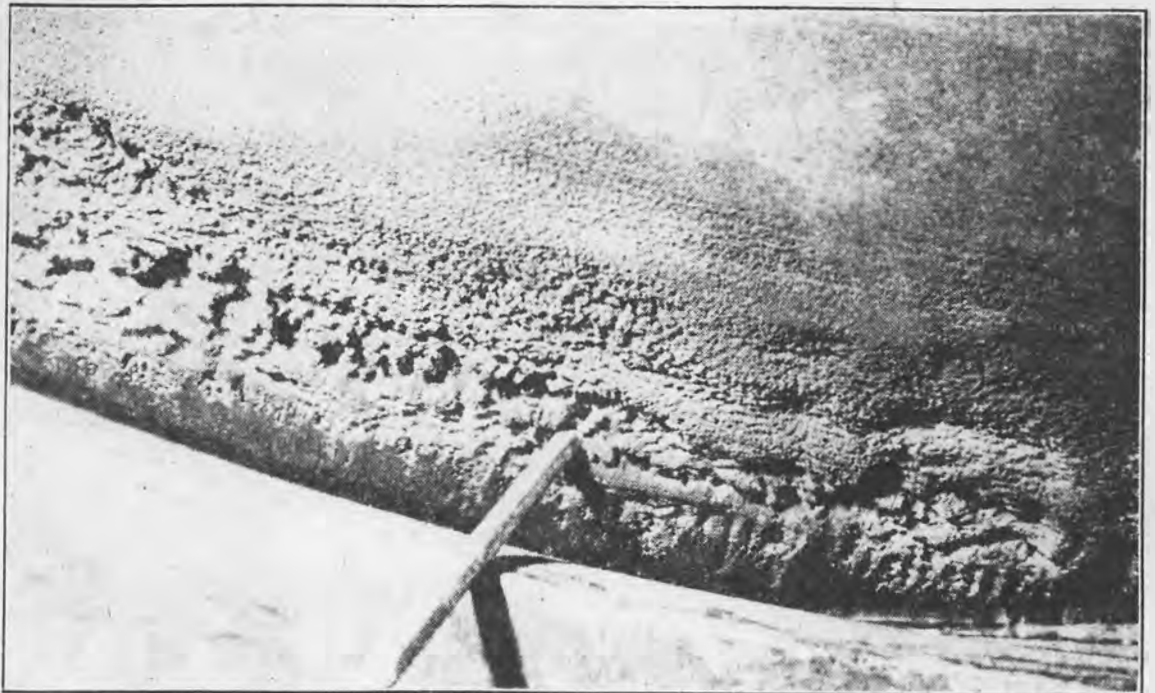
ENLARGED VIEW OF SECTION IN FIG. 31 EMPHASIZES THE SEVERE PITTING ON THE SHOULDER OF THE NEEDLE VALVE WHICH REQUIRES EXPENSIVE MAINTENANCE BY WELDING
